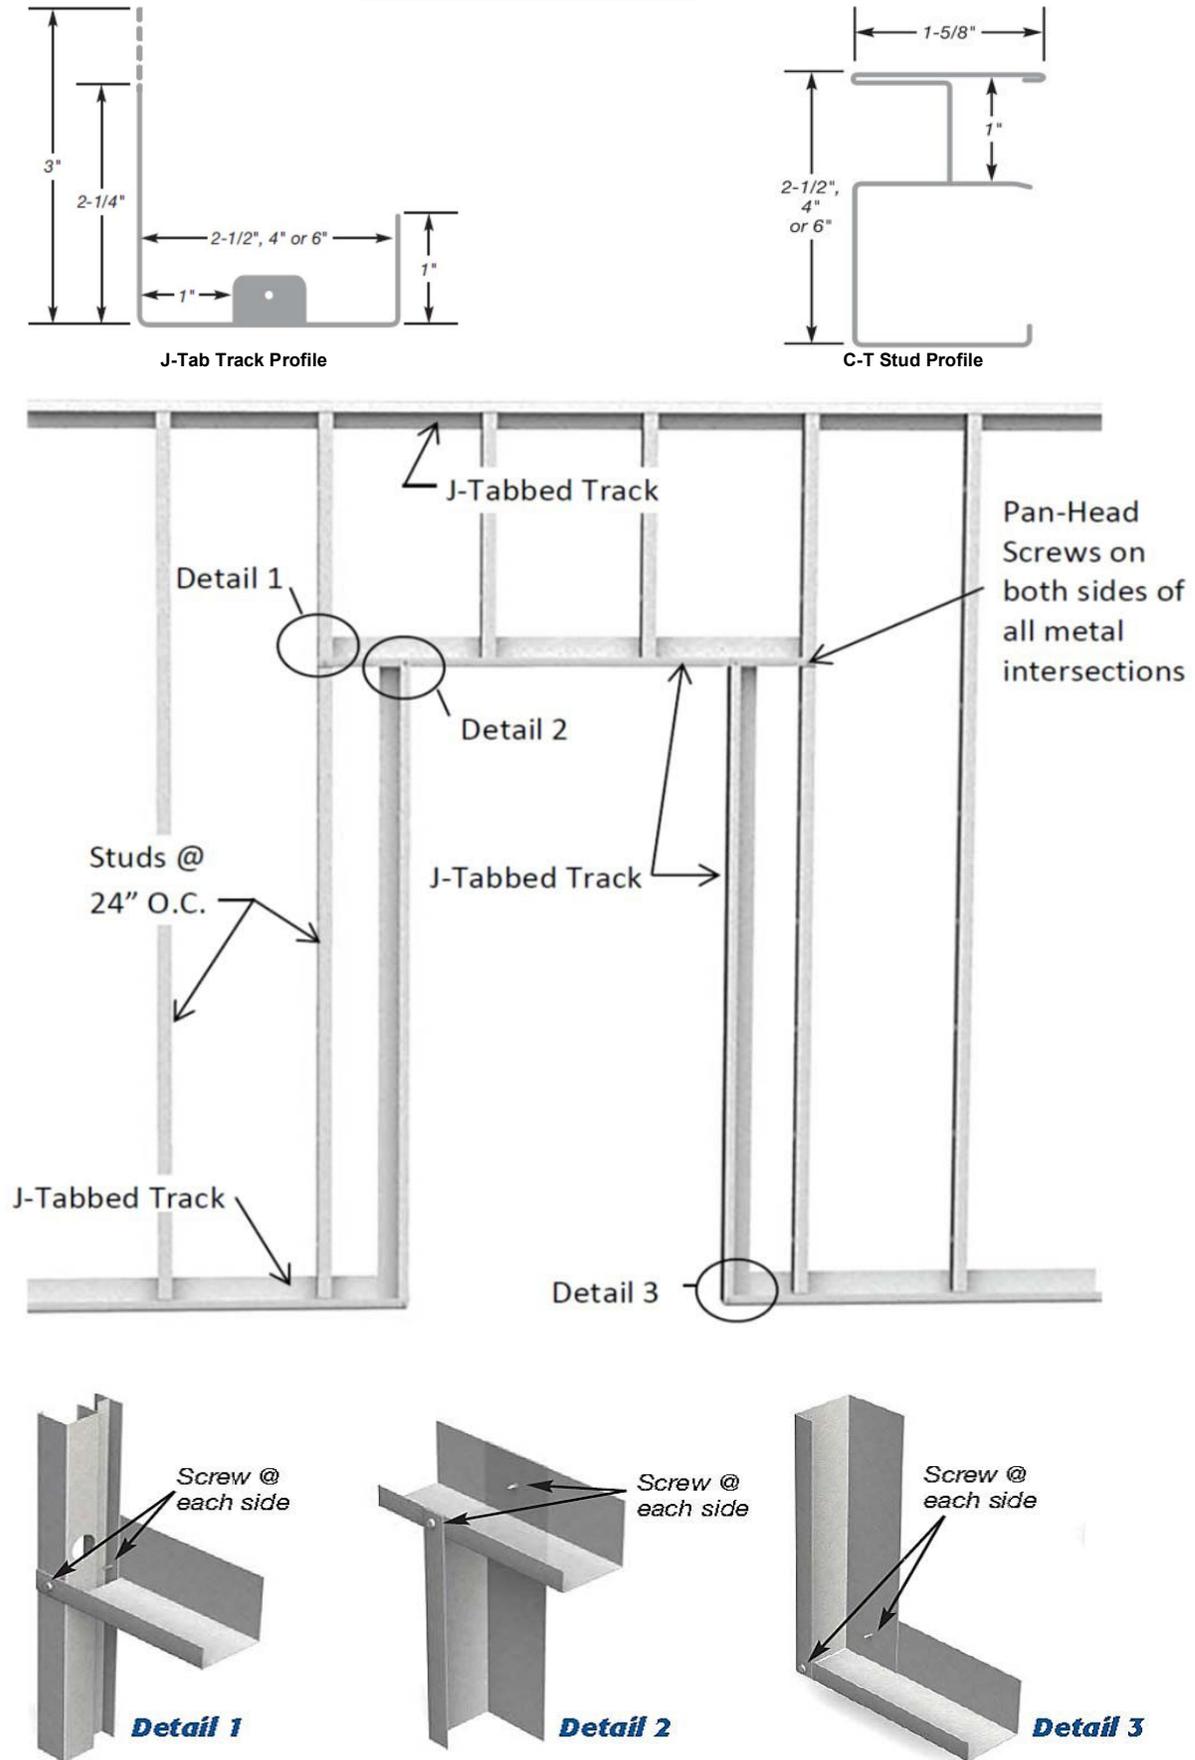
CONSTRUCTION DETAIL FRAMING
